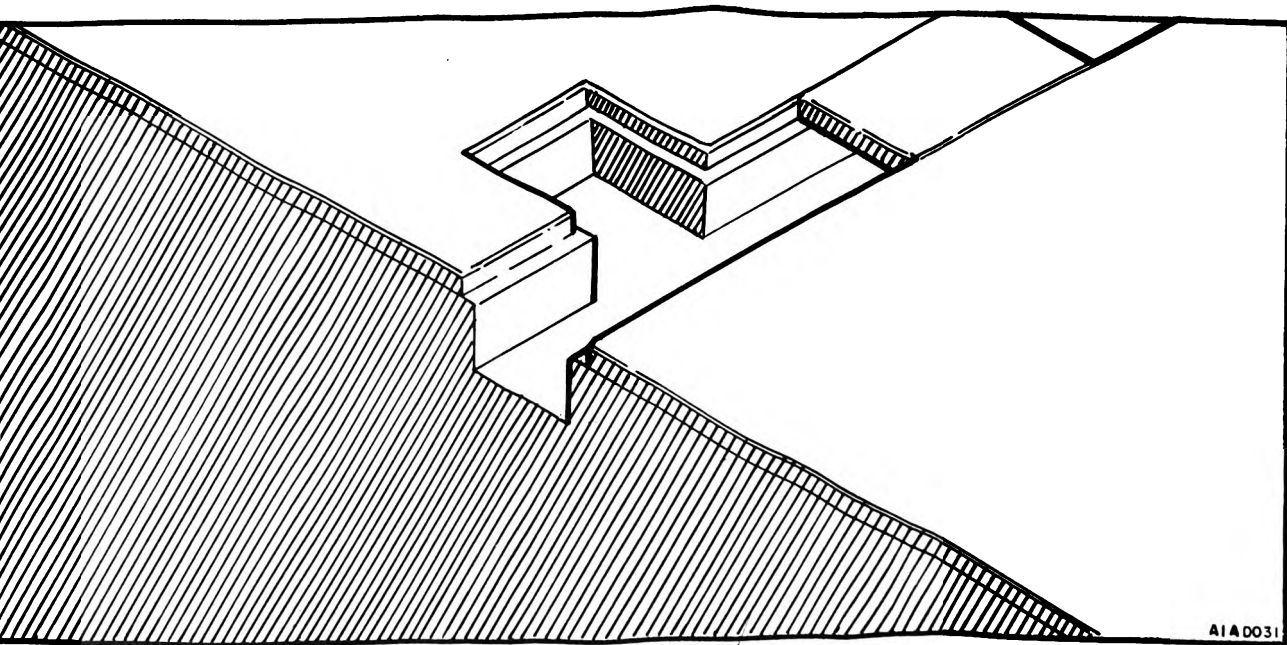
Raceway Floor (Covers Removable, Cutouts in Covers)
